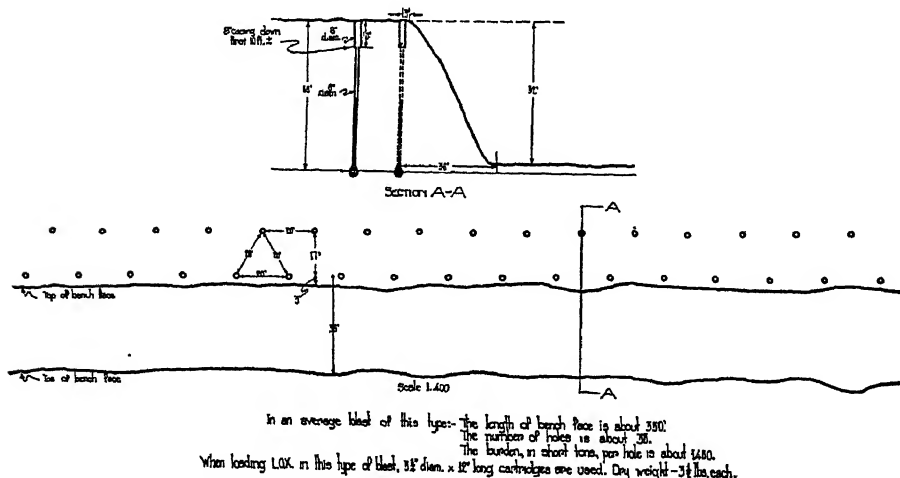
TYPICAL CHURN-DRILL HOLE SPACING FOR POCKET AND BARREL LOADING.
